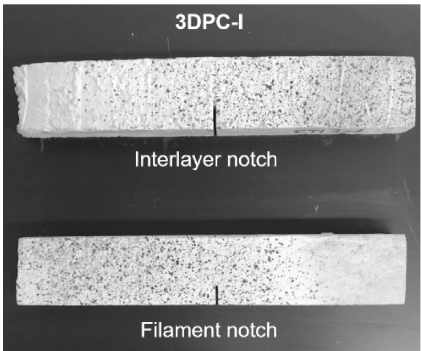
3D printing concrete fracture test specimens containing notches.
